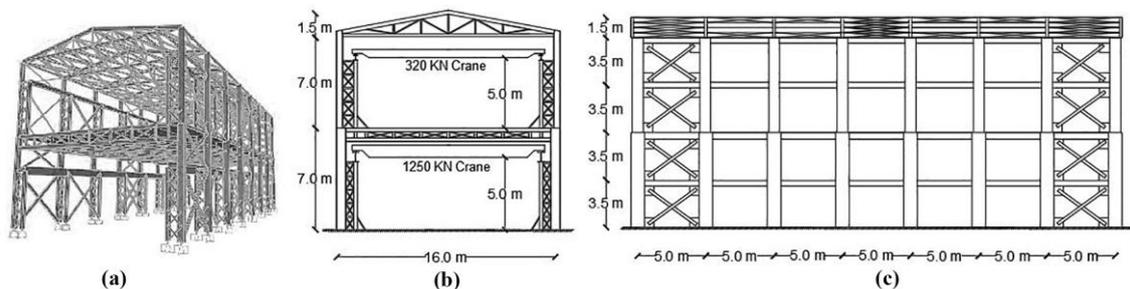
Industrial building shape and dimensions, a) 3D view, b) Cross section, c) Longitudinal view.
